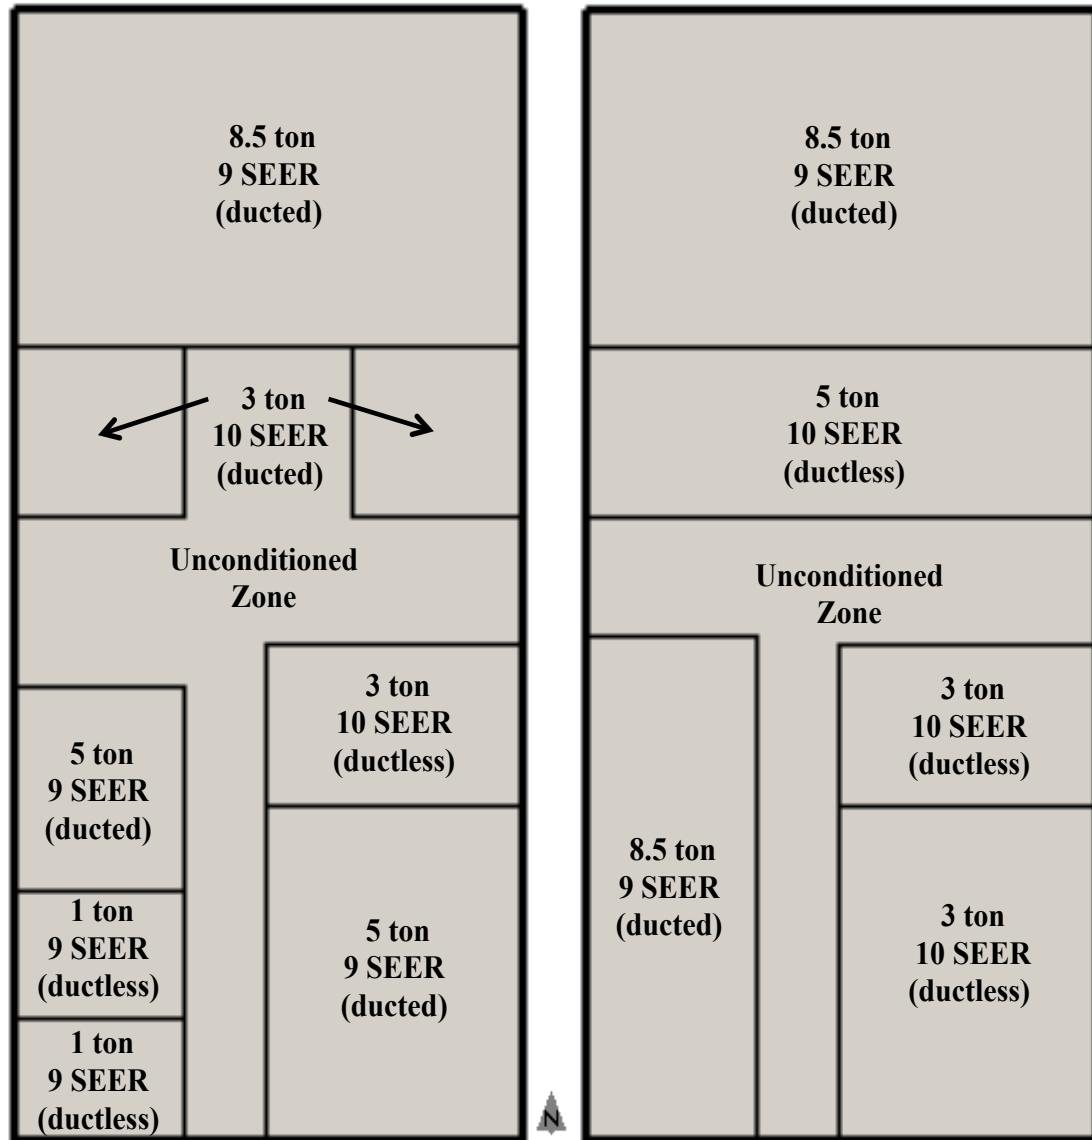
First floor (left) and second floor (right) AC zone allocations and specifications
